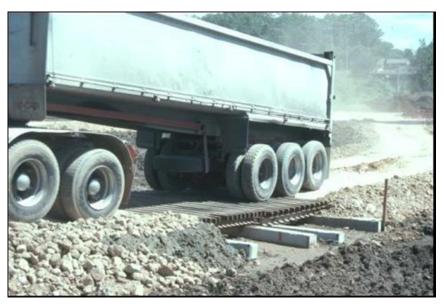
Rumble strip similar to that illustrated above will be placed at the main site access.
